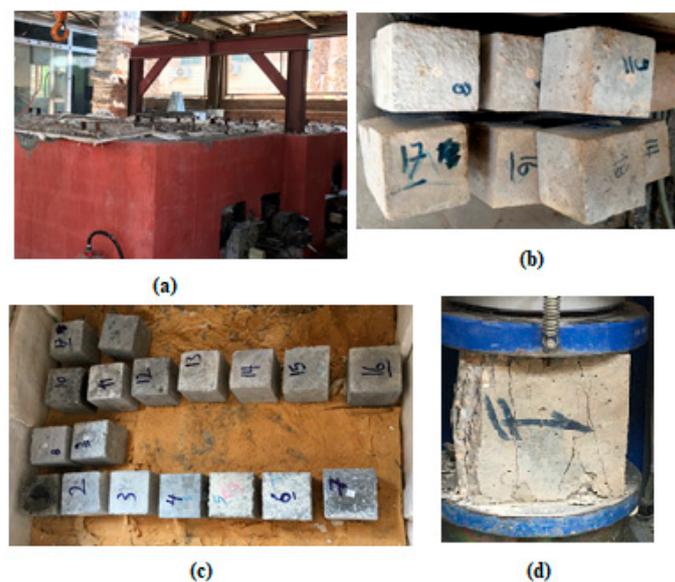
Elevated temperature test of concrete specimens: (a) electric furnace device; (b) placing samples in furnace before test; (c) cubic concrete specimens after fire; (d) compressive strength testing after fire.
